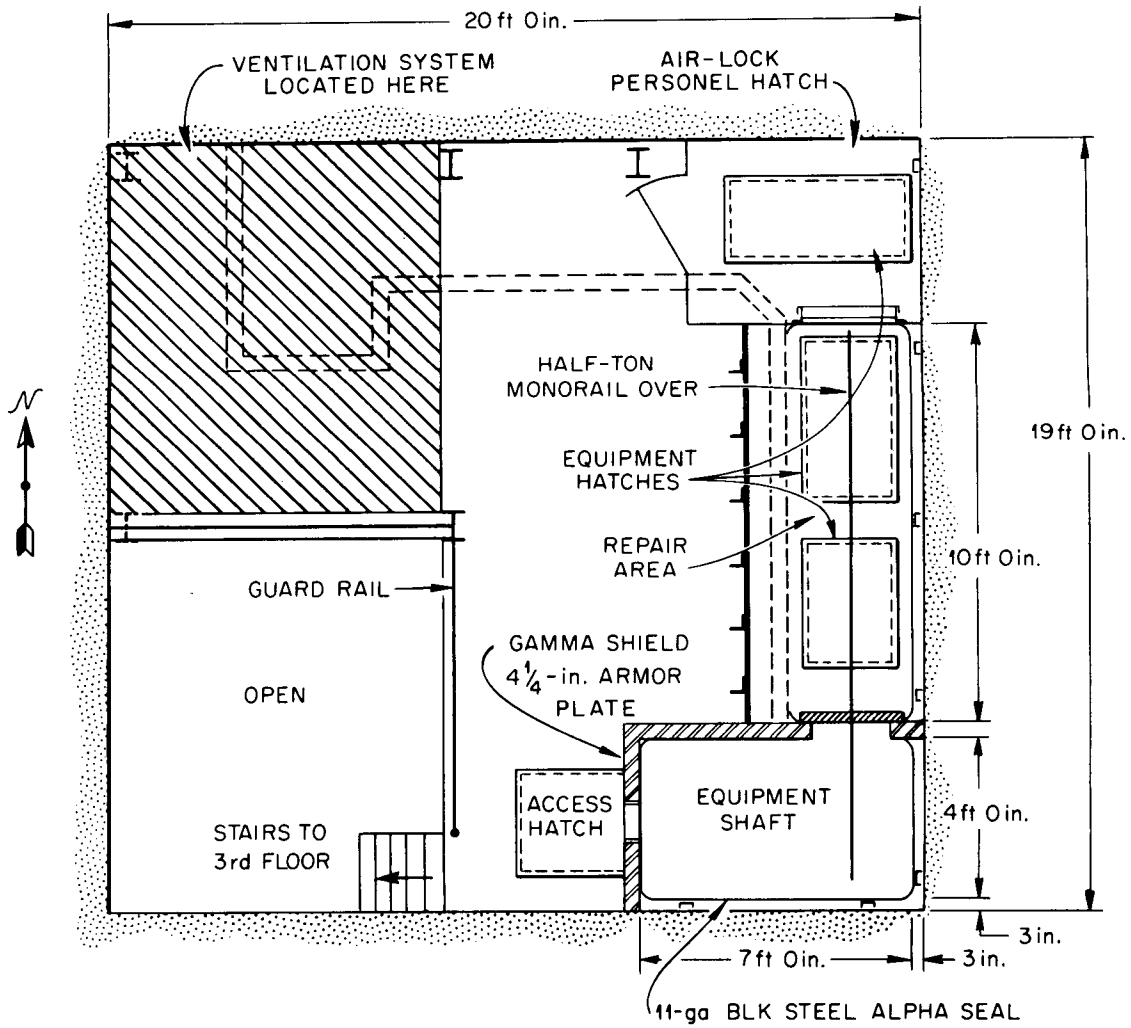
Second Floor Plan - Rod Fabrication Facility.
